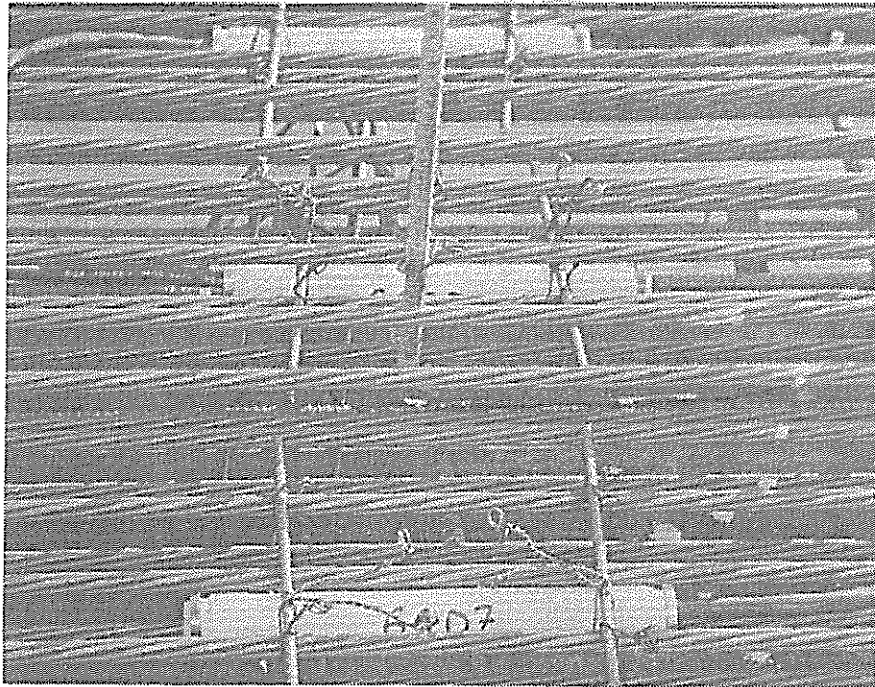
Strain meters and weldable gauges in lower flange.
